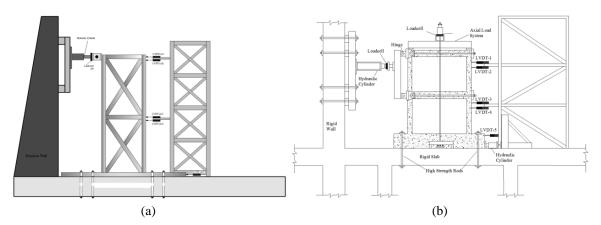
Lay-out of loading system and LVDT (a) CSBF; (b) base RC frame
